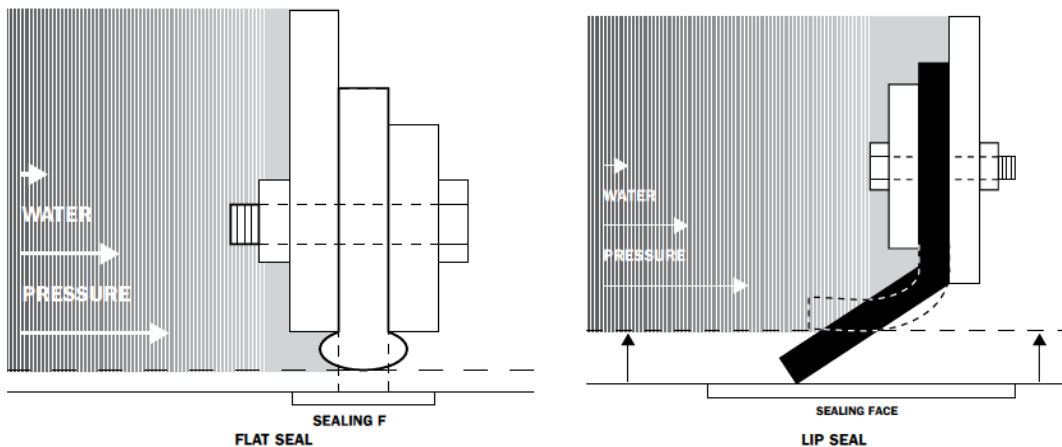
(L) Flat seal [55] & (R) Lip seal [55]
